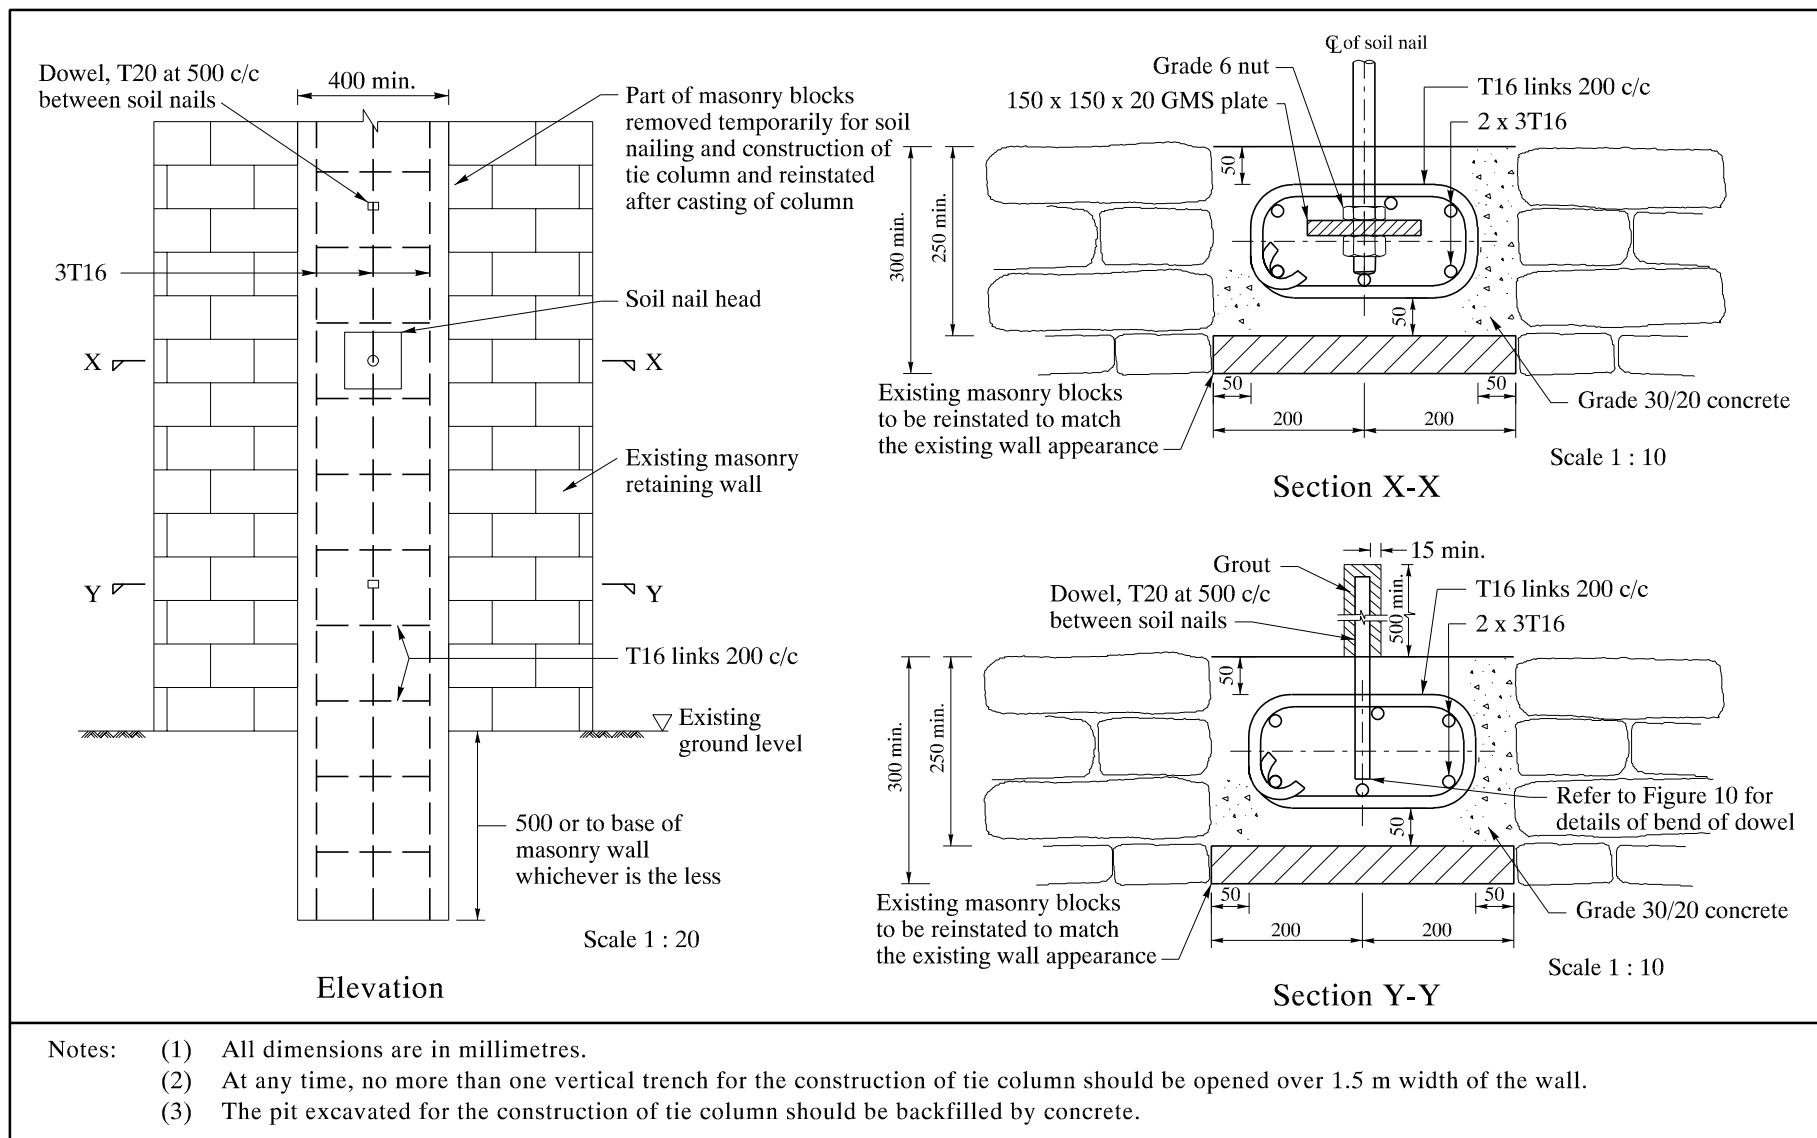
Details of Concealed Tie Column for Mansonry Retaining Wall
